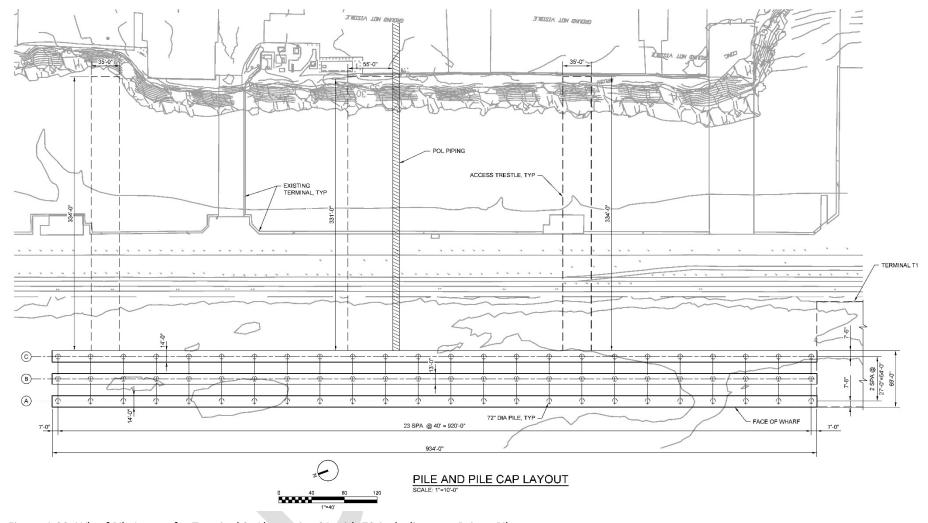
Wharf Pile Layout for Terminal 2: Alternative 2A with 72-inch-diameter Driven Piles
